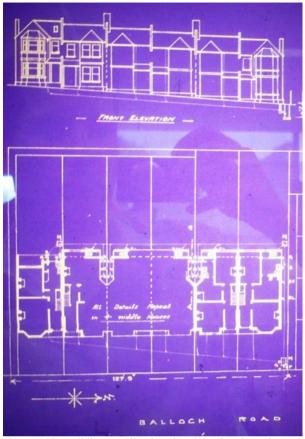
Building Application drawings for above houses by architect & surveyor E.J.W. Hider, 1905 (Building and Drainage Applications, Balloch Road, Lewisham Local History Archive)
